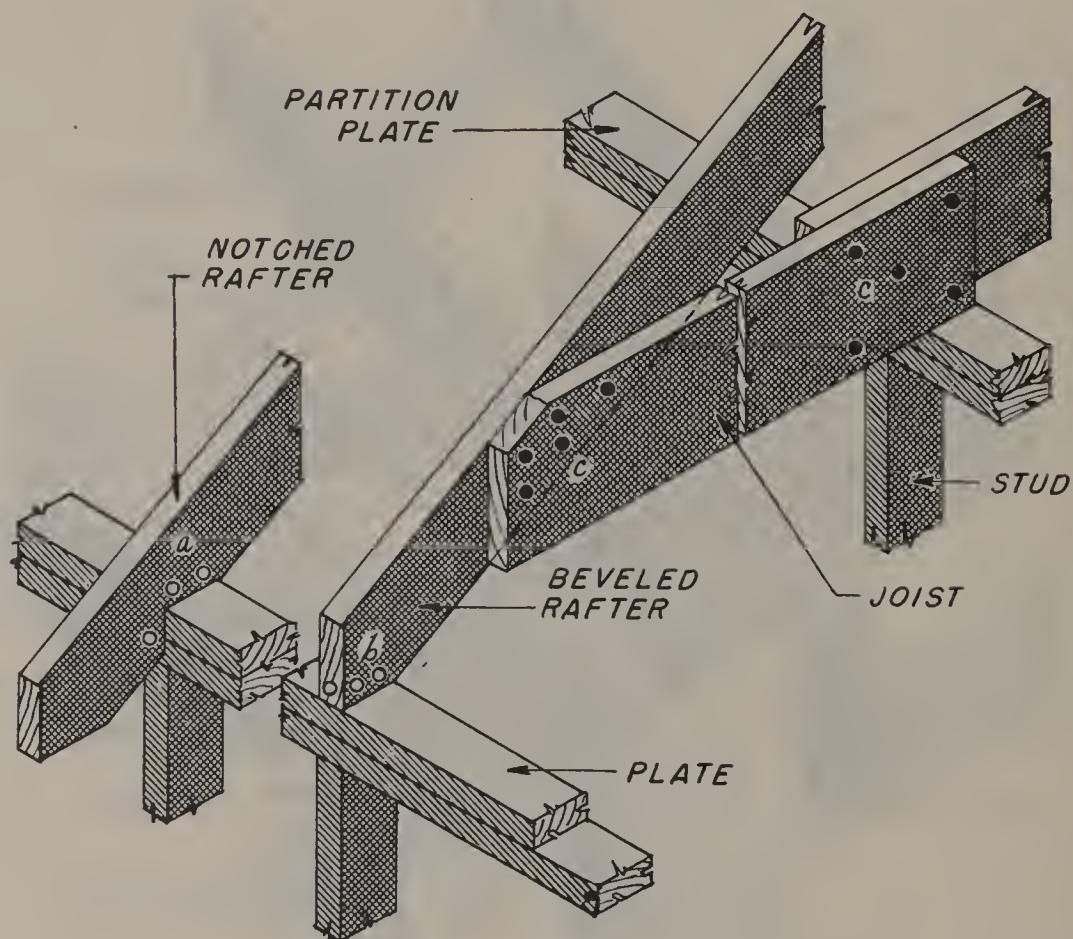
Rafter notched or beveled at wall plate with ceiling joist at higher level. *a*, Notched rafter toenailed to upper face of plate with two tenpenny nails on each side and to outer edge of plate with one tenpenny nail on each side of rafter. *b*, Beveled rafter nailed to upper face of plate with two tenpenny nails on each side and one tenpenny nail through vertical cut of rafter. *c*, Ceiling joist nailed to rafter with five tenpenny nails and overlap nailed with five tenpenny nails. Note: This nailing affords good resistance to thrust but is deficient in resistance to uplift. Resistance to uplift can be augmented by the use of straps as shown in figures 49 and 50.
